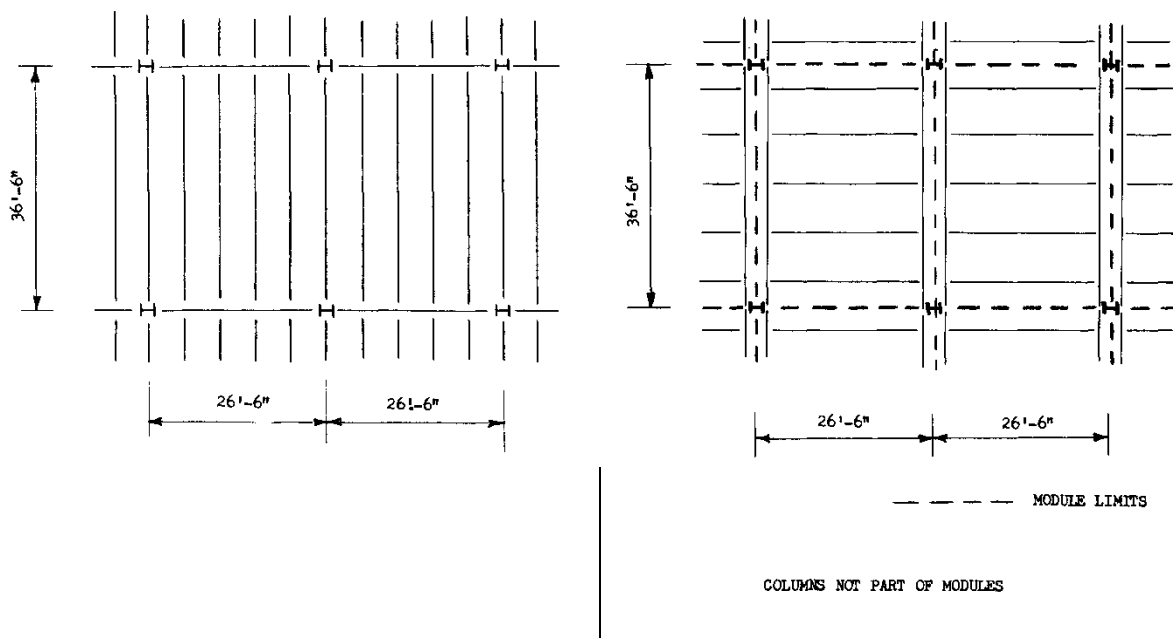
Comparison of conventional (left) and modular (right) steel arrangements for the control building floor (pp. 3.2-60 & 61 respectively [60]).
